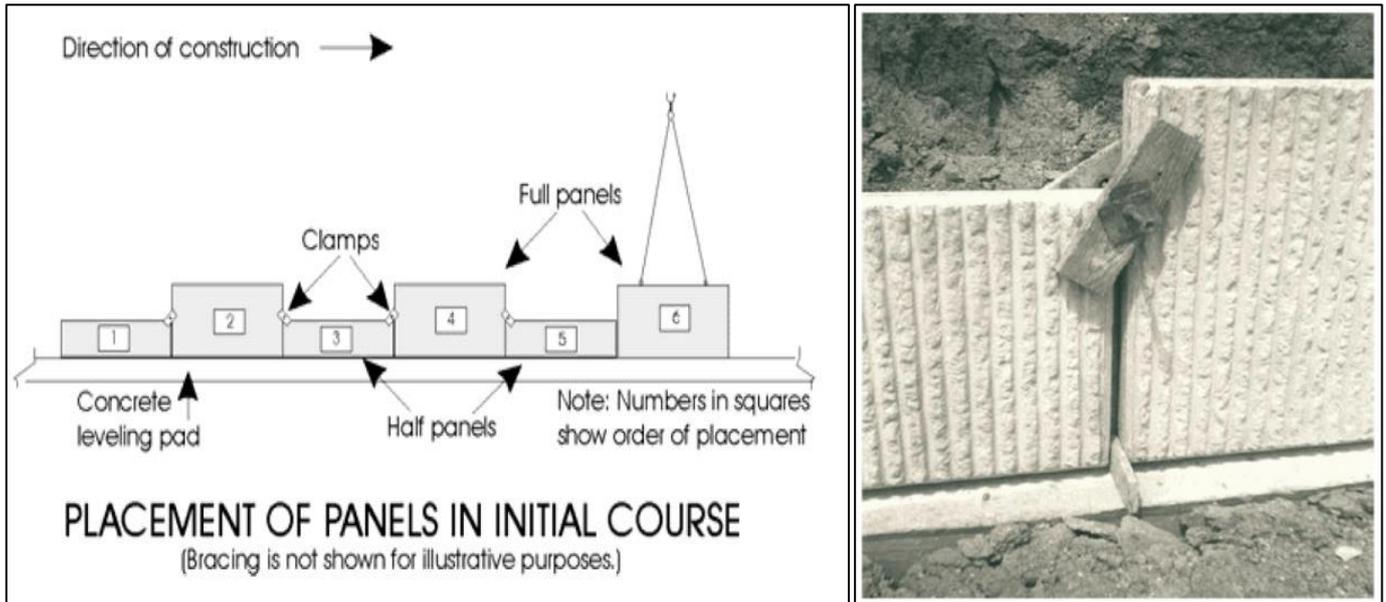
Positioning the Panels in the Starting Row onto the Concrete Levelling Pad.(Bailleul Guillaume and Laga Matthias 2017)
